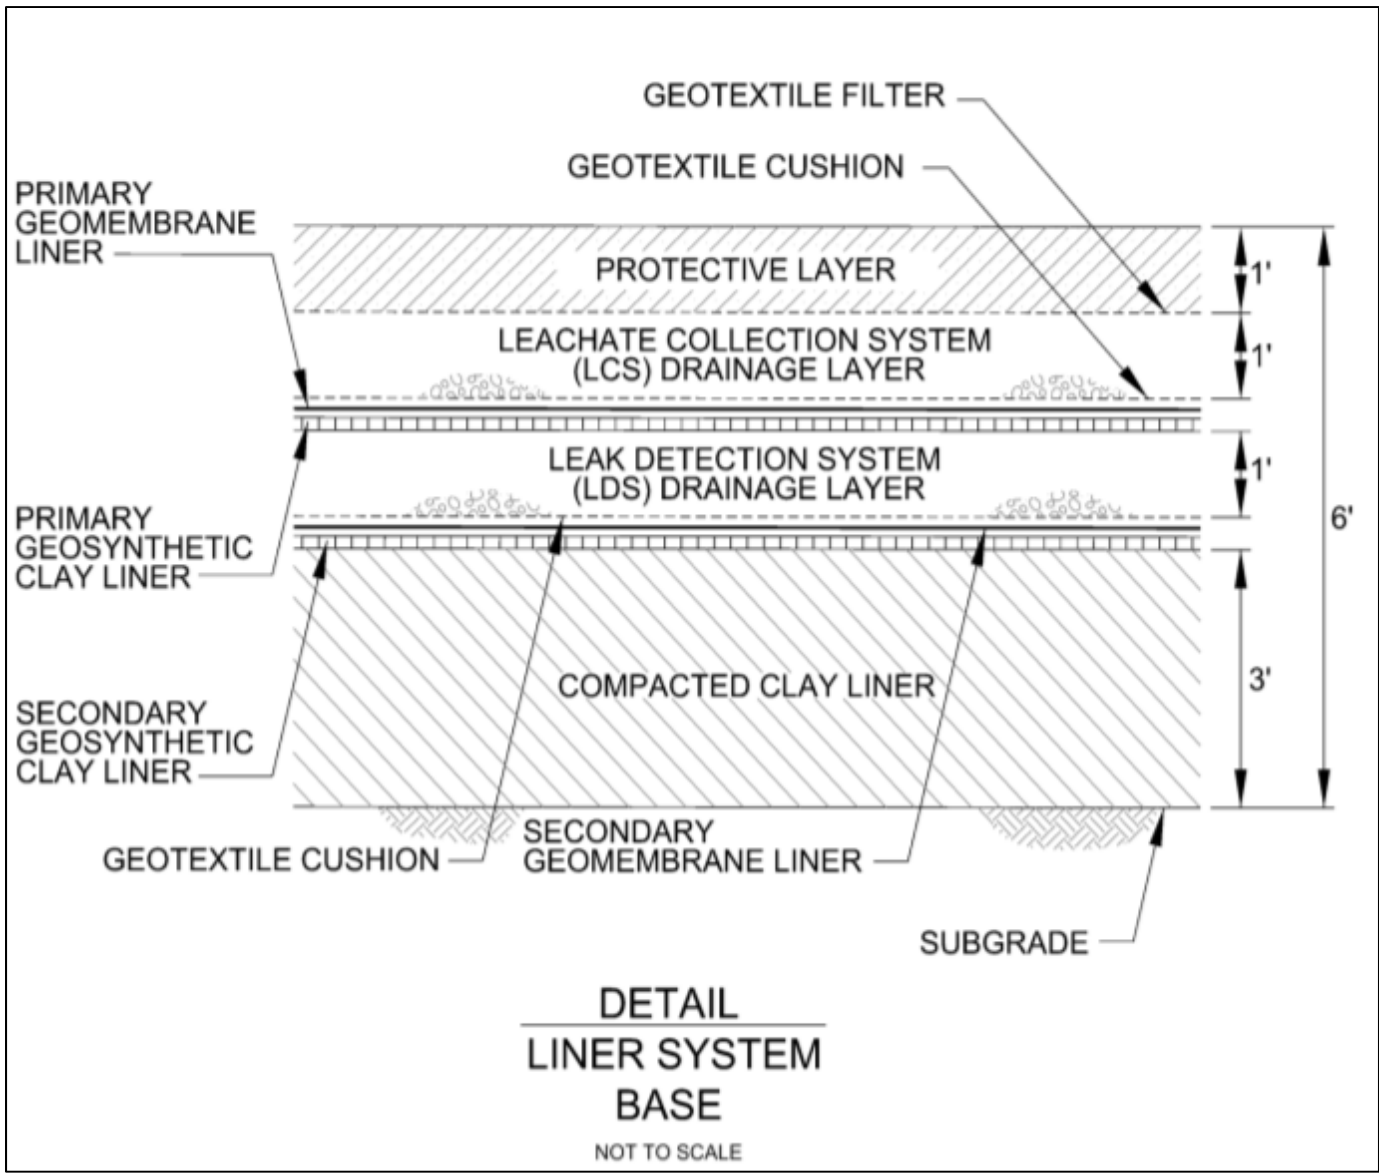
Typical Section View – Landfill Base Liner System Details for Alternative 2
